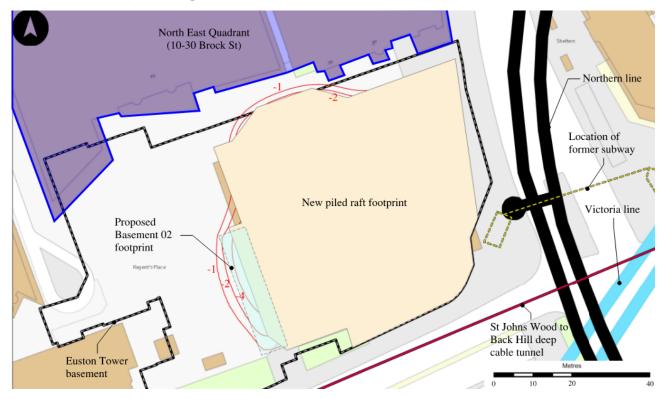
Calculated short term heave (mm) at basement level +21.6mOD resulting from partial superstructure deconstruction and proposed Basement 02 excavation.
